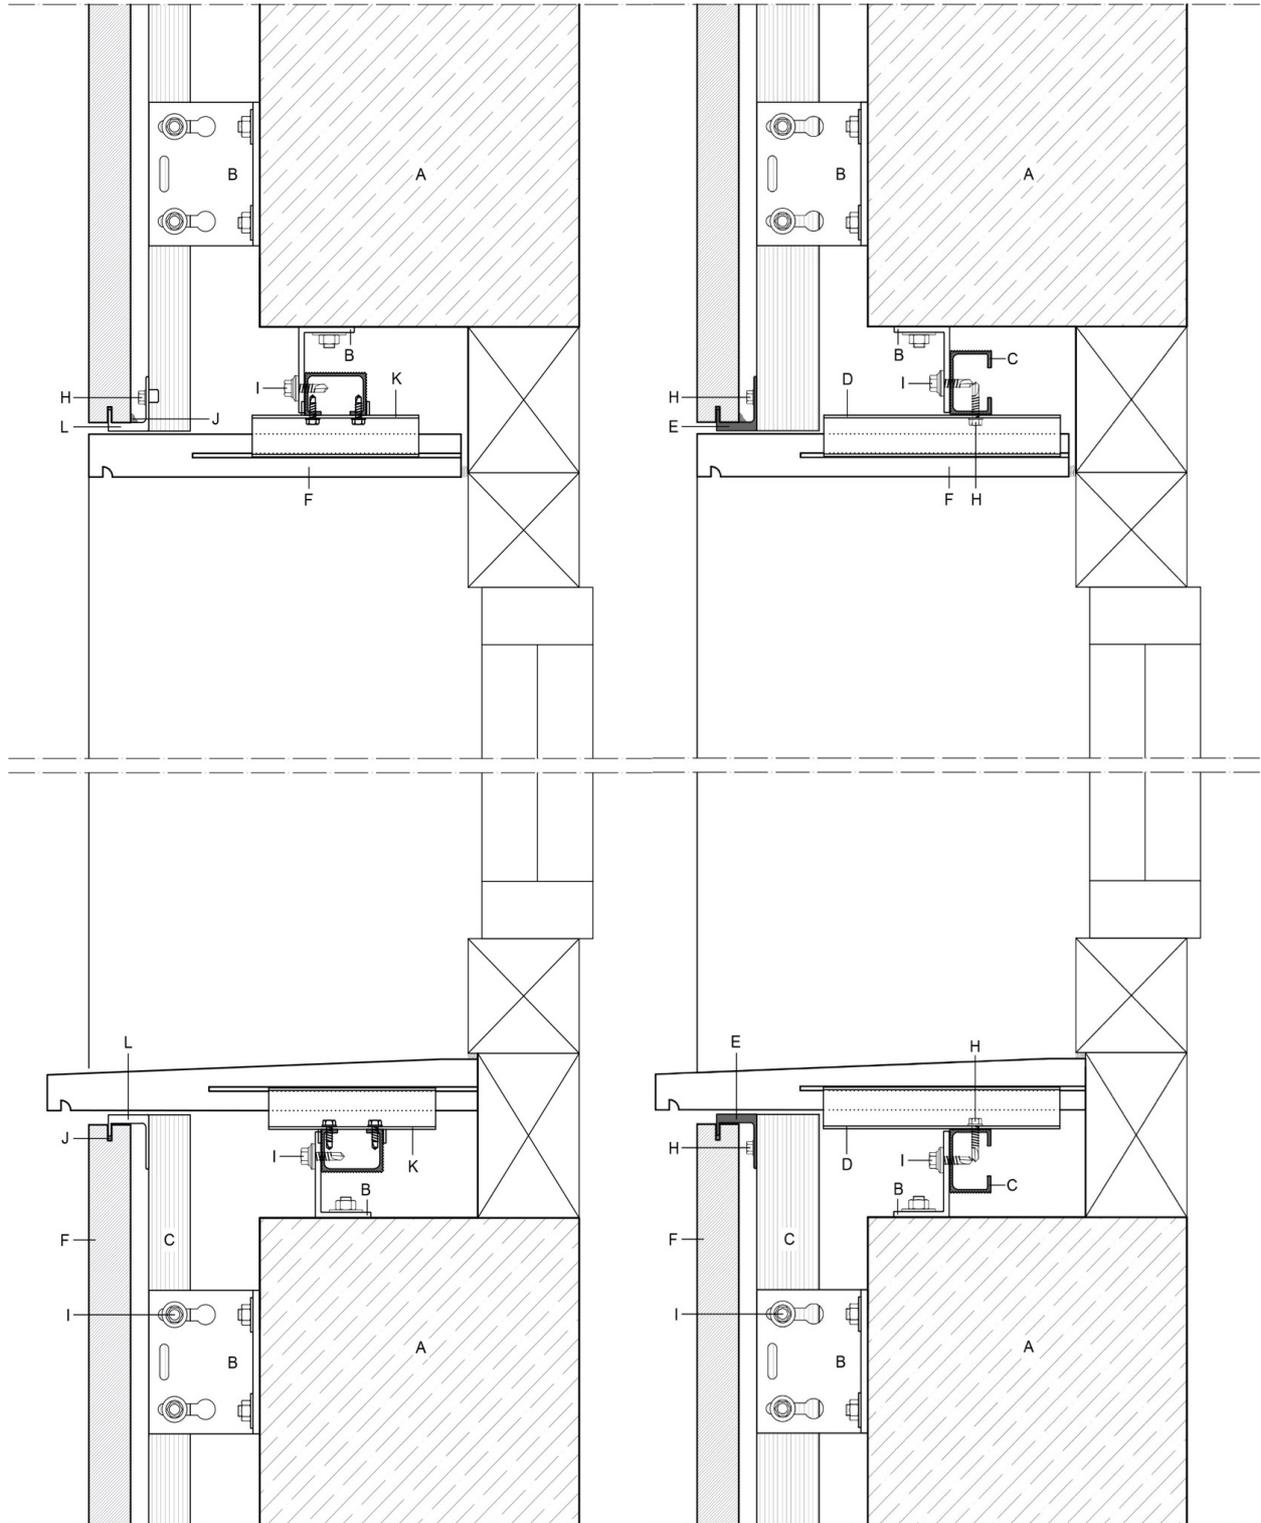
WINDOW DETAIL – VERTICAL SECTION
